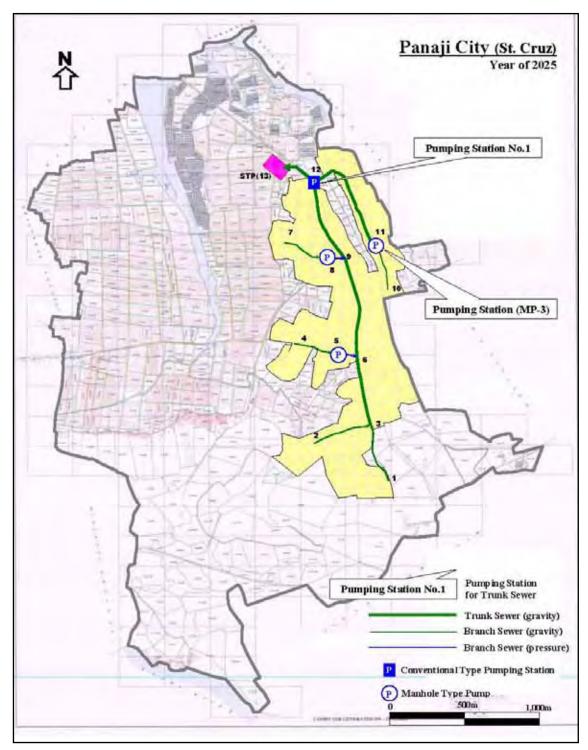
Proposed Sewerage Service Area of St. Cruz
